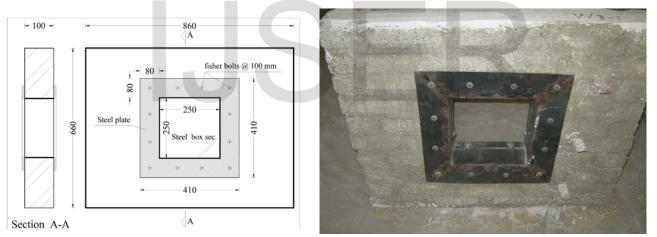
Details of the used rehabilitation technique using steel plate box-section (2x100 mm, 3x100 mm) inside opening welded with squareshaped steel plate at both sides.
